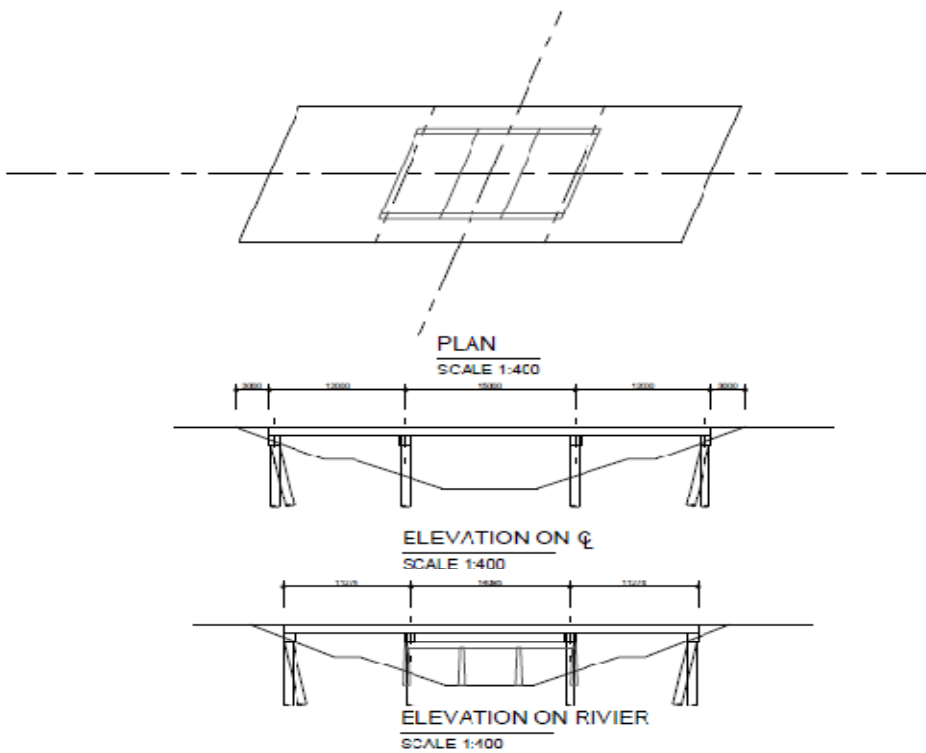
The Existing and Future Plan and Elevation for the Rooisloot Bridge
